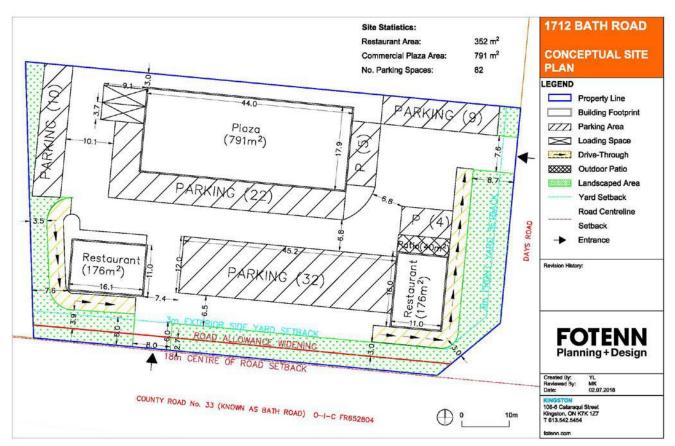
Concept Plan (Source: Fotenn Consultants Inc.)
